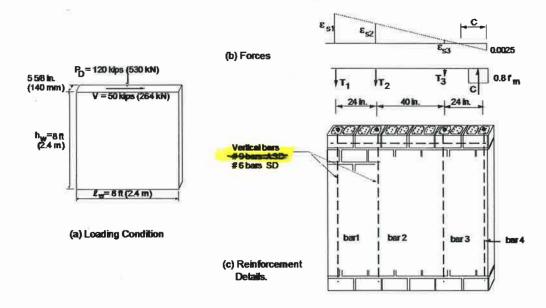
Strength design of masonry shear wall for Example 10.4.
